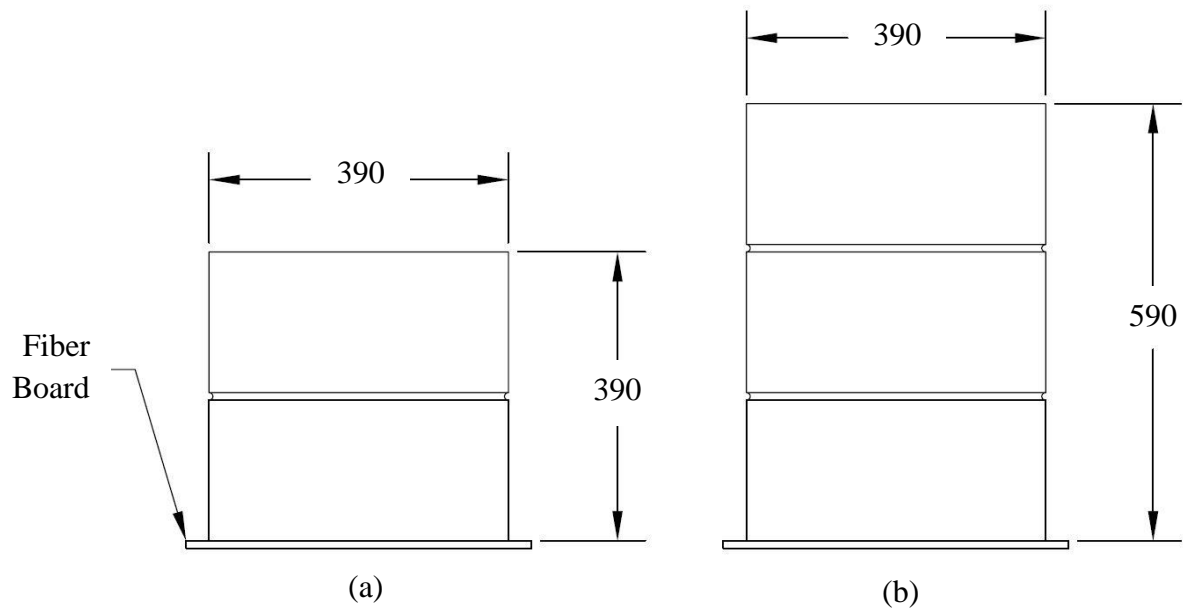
Companion Specimens: (a) Bond Wrench Prism, and (b) Three-Course Prism (Dimensions in mm)
